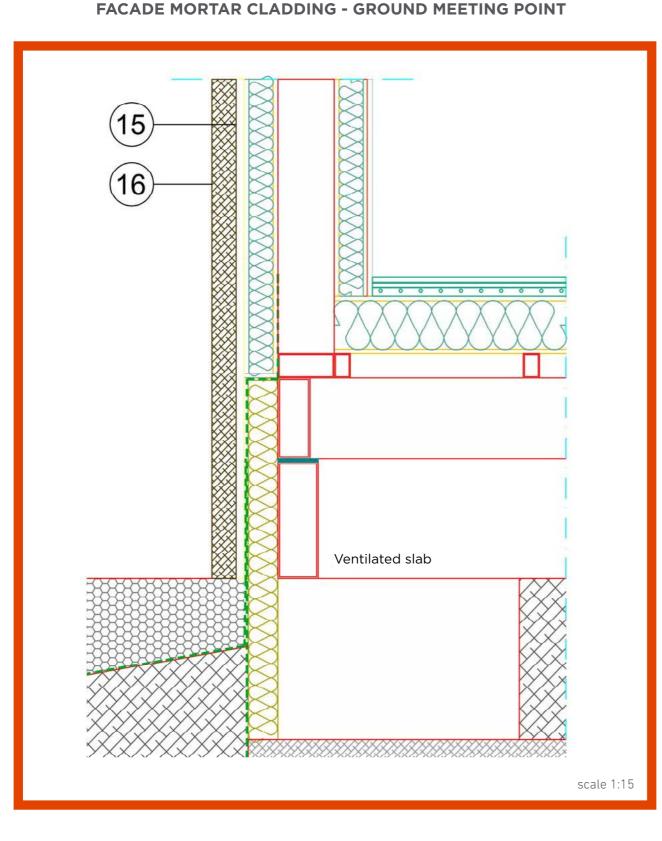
a MORTAR FACADE - GROUND MEETING POINT
